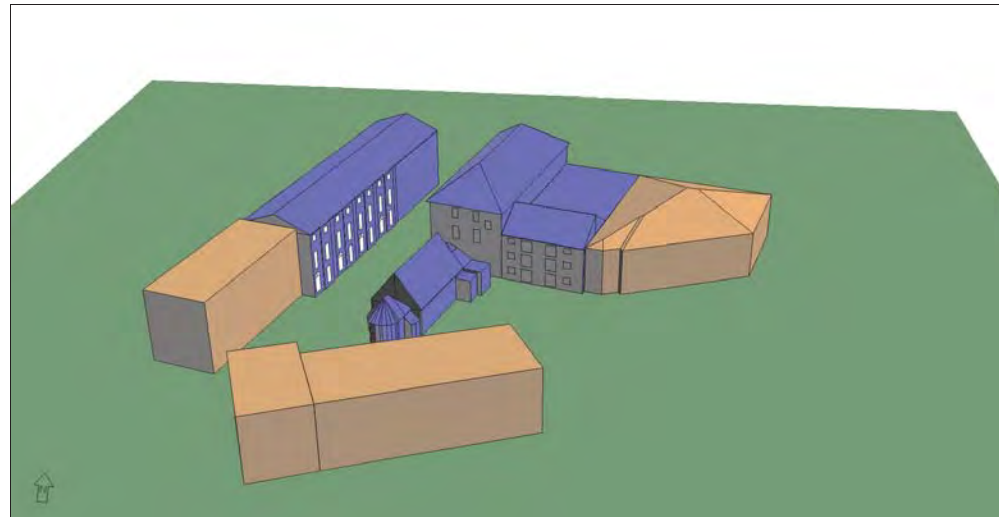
3D Model image showing proposed extension and new church spire to the Mission Gallery and critical adjacent buildings, namely the south-facing façades of Gloucester House and Marina and the facing residential buildings of Gloucester Place.
